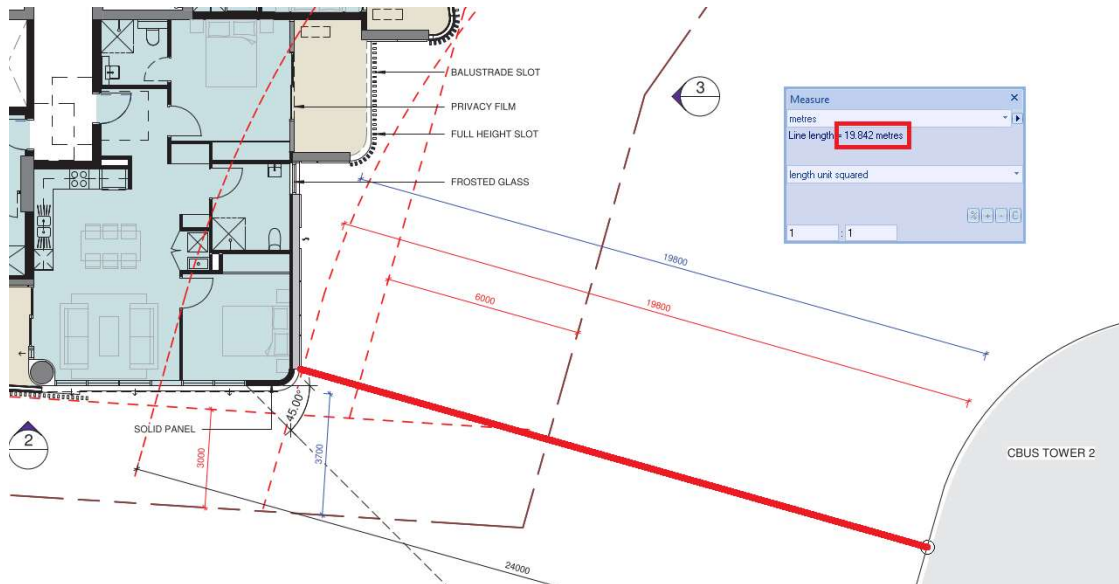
Minimum Separation between proposed tower and CBUS Tower 2.
